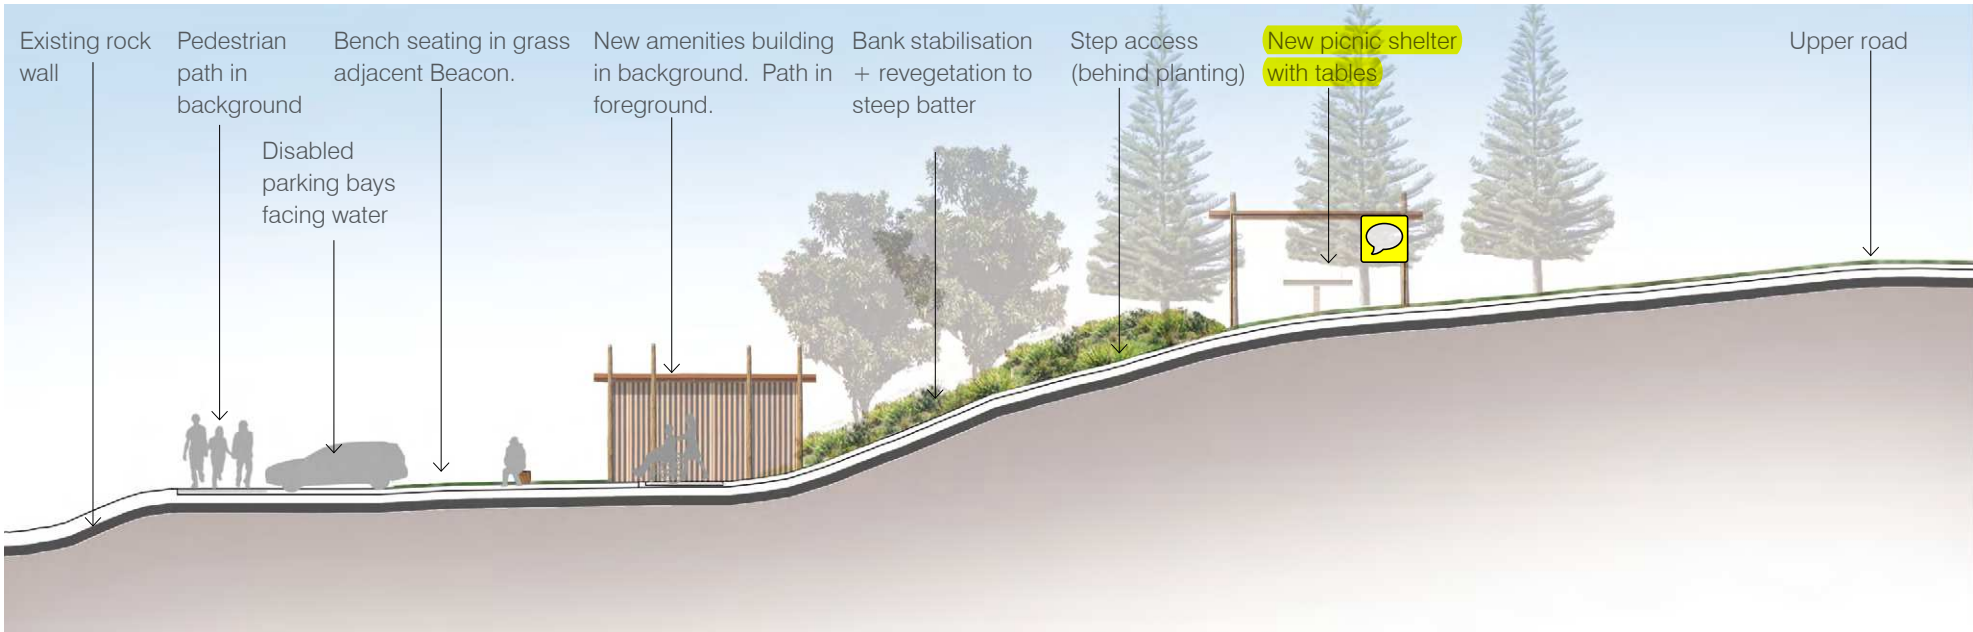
Bruce Steer Pool DRAFT Coastal Accessibility Plan
